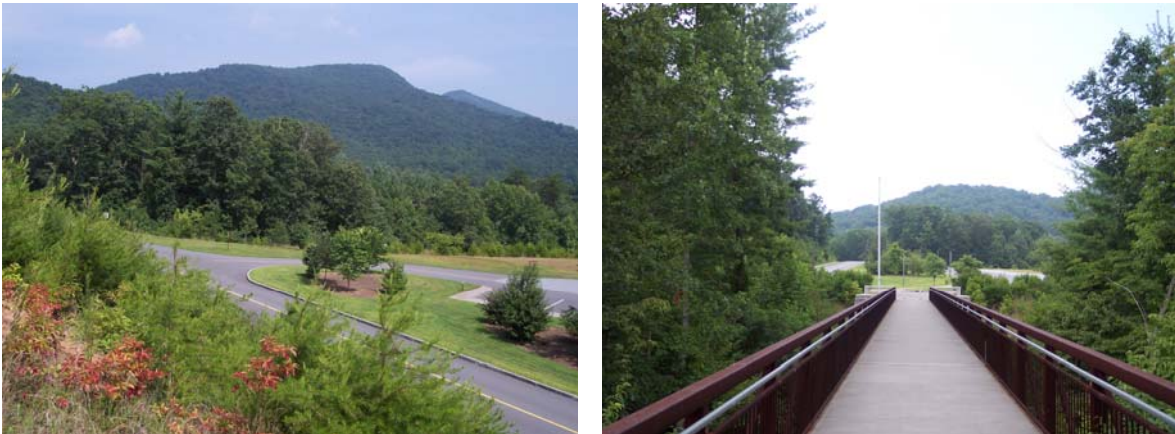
EXISTING CONDITIONS AT HEMPHILL KNOB SHOWING ENTRANCE ROAD, OFFSITE MOUNTAIN VIEWS AND ALTERNATIVE B LOCATION FROM THE HEADQUARTERS
